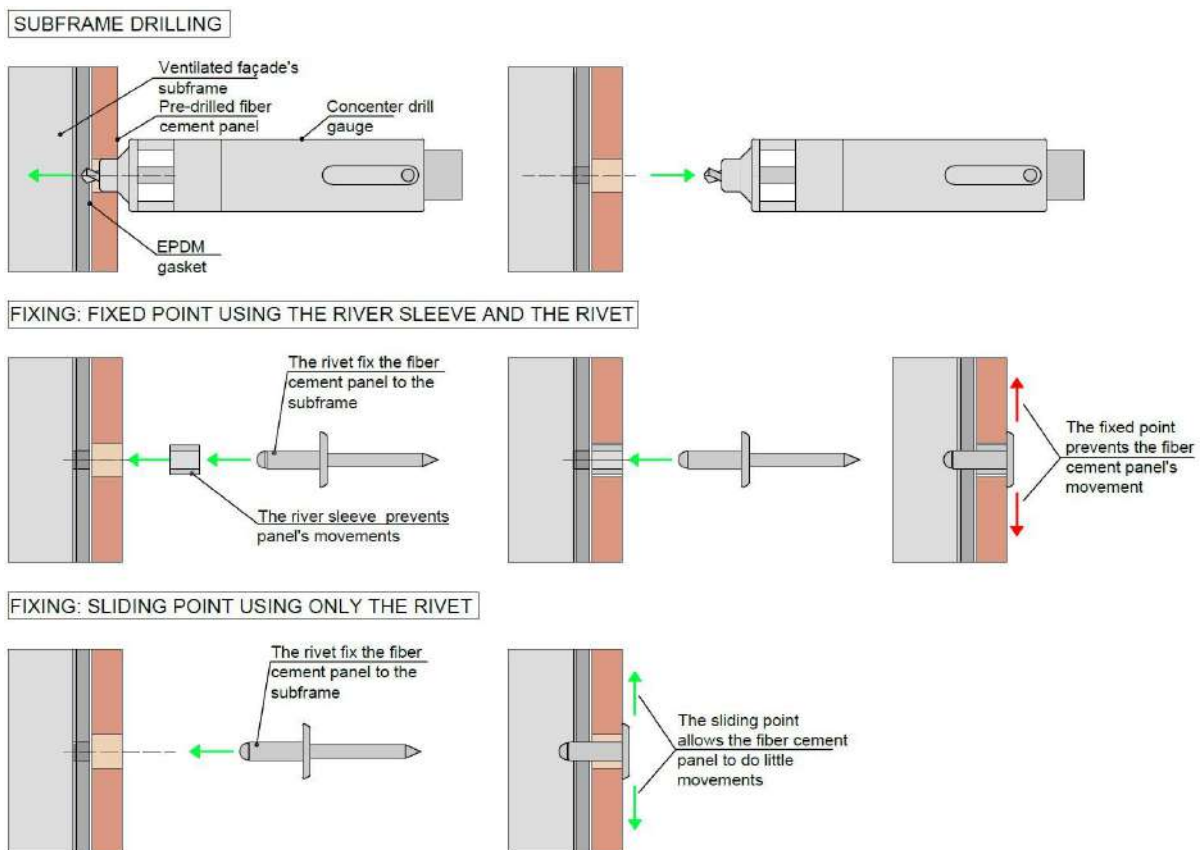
Example of steps to fix Silbonit fiber-cement panels. The panels are pre-drilled with holes that all have the same diameter of 9.5 mm. The example shows how the diameters of the holes for the fixed points are reduced using suitable metal bushings.
